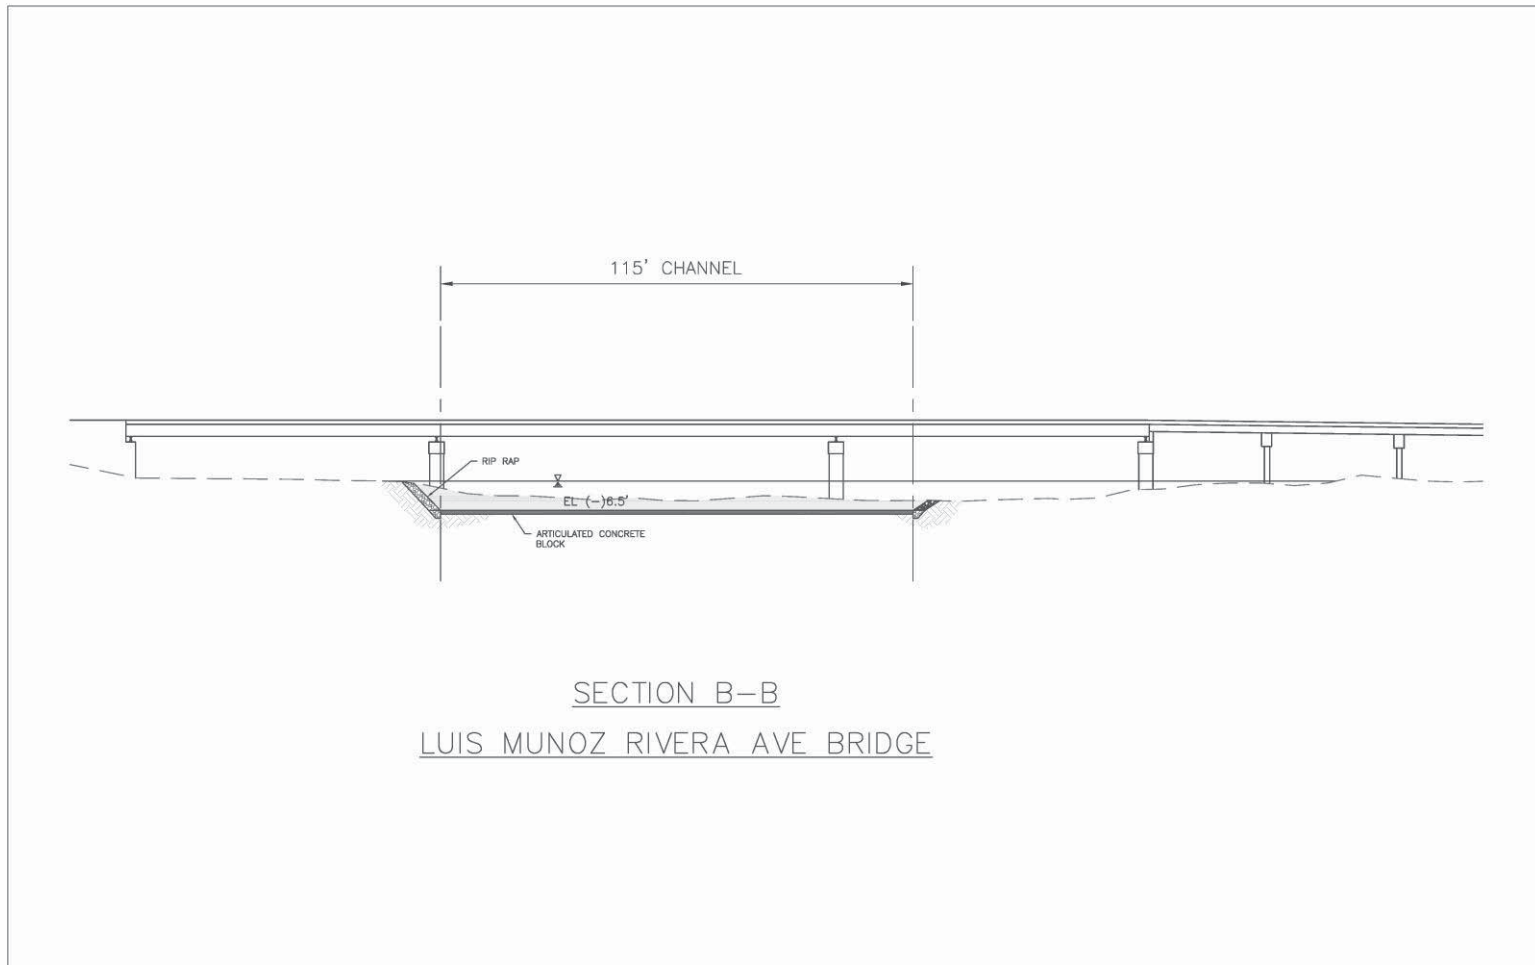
Cross Section B-B, Luis Muñoz Rivera Avenue Bridge
